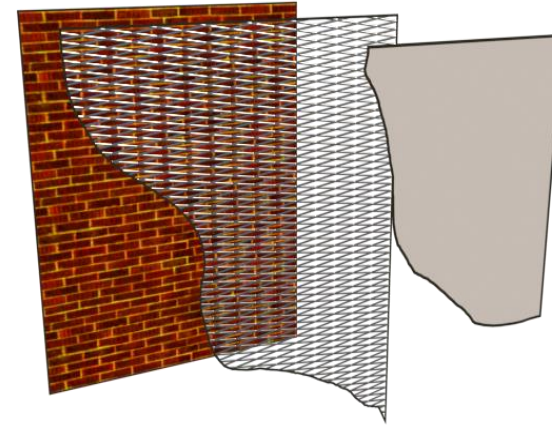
33. Ferrocement plaster (see details on next page)
